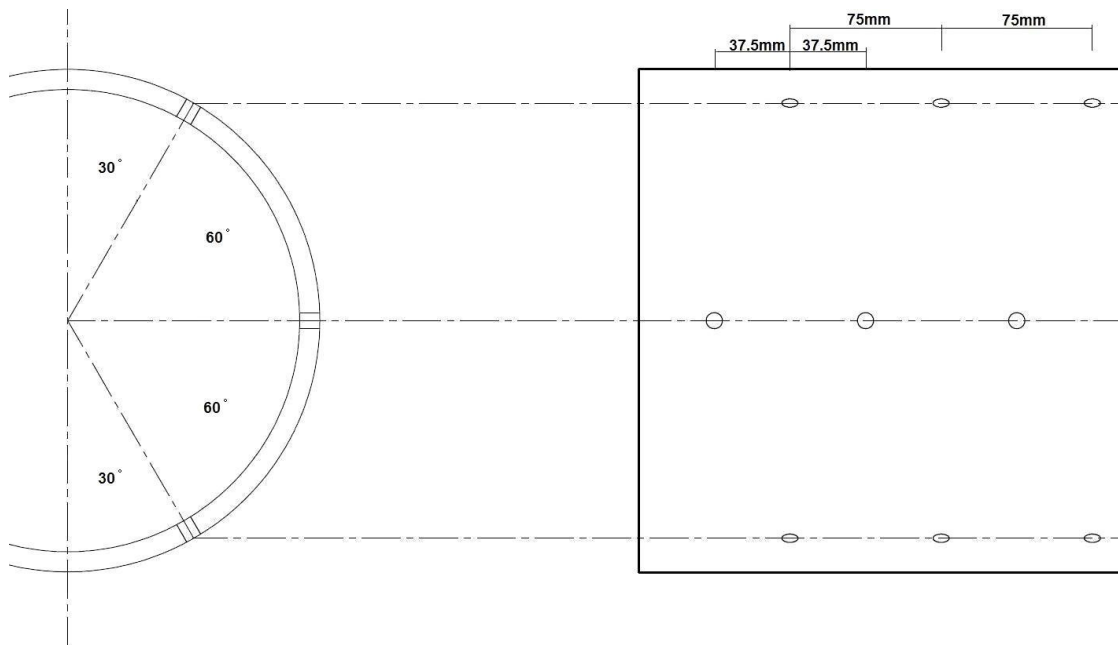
Section and Elevation of $\varnothing 250\text{mm}$ Perforated PVC Pipe
